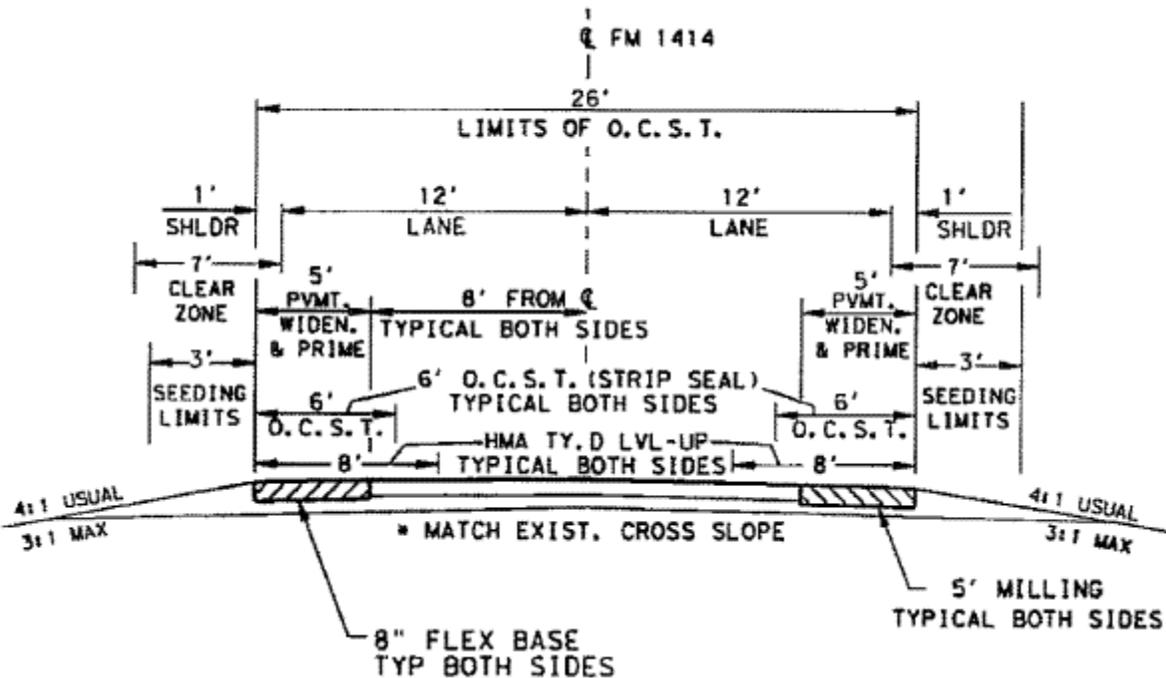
Proposed typical section of narrow widening (FM 1414 Project)
